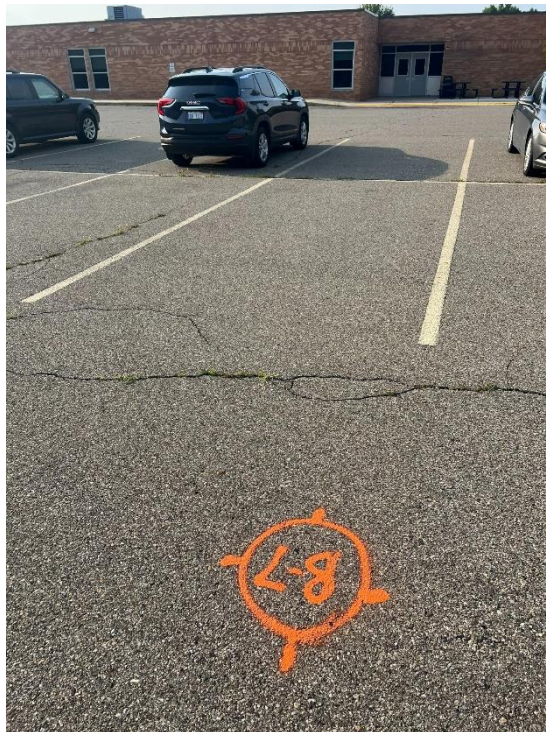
High severity fatigue and joint cracking looking north toward B-6.
